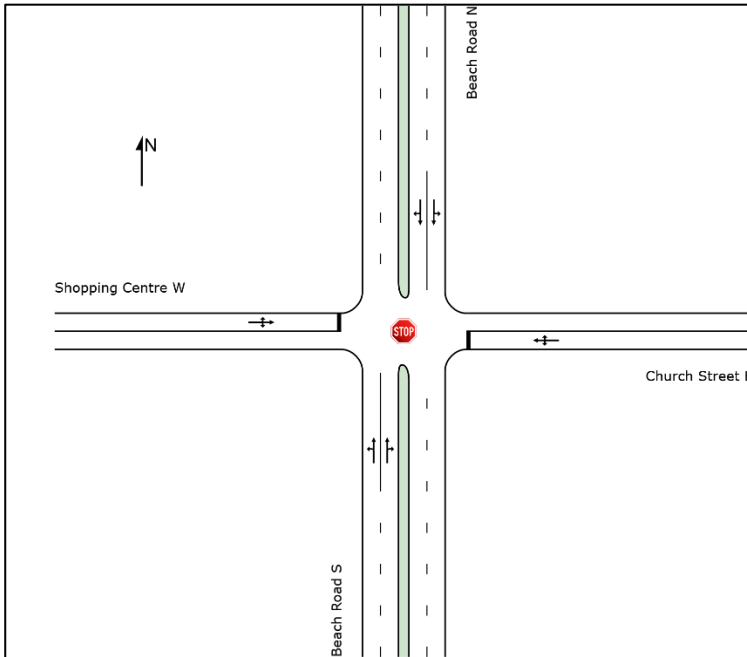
Existing Intersection Layout: Beach Road & Church Street
